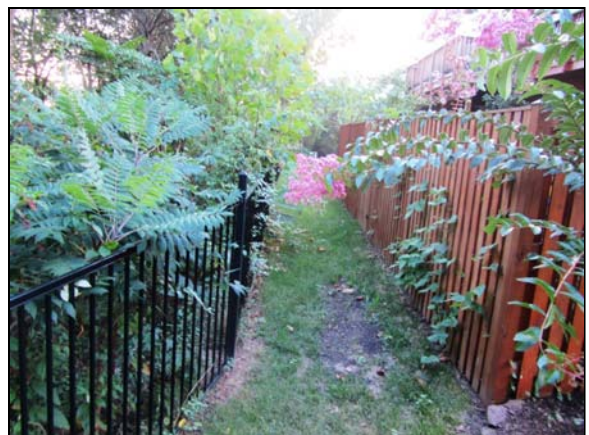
General view of Retaining Wall #3 located behind 14101-14105 Catbird Drive.
